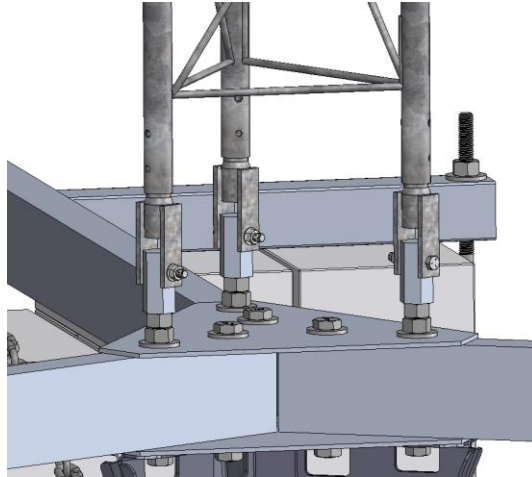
Final connection of Kuva Tower Section / hinged coupler after lift
